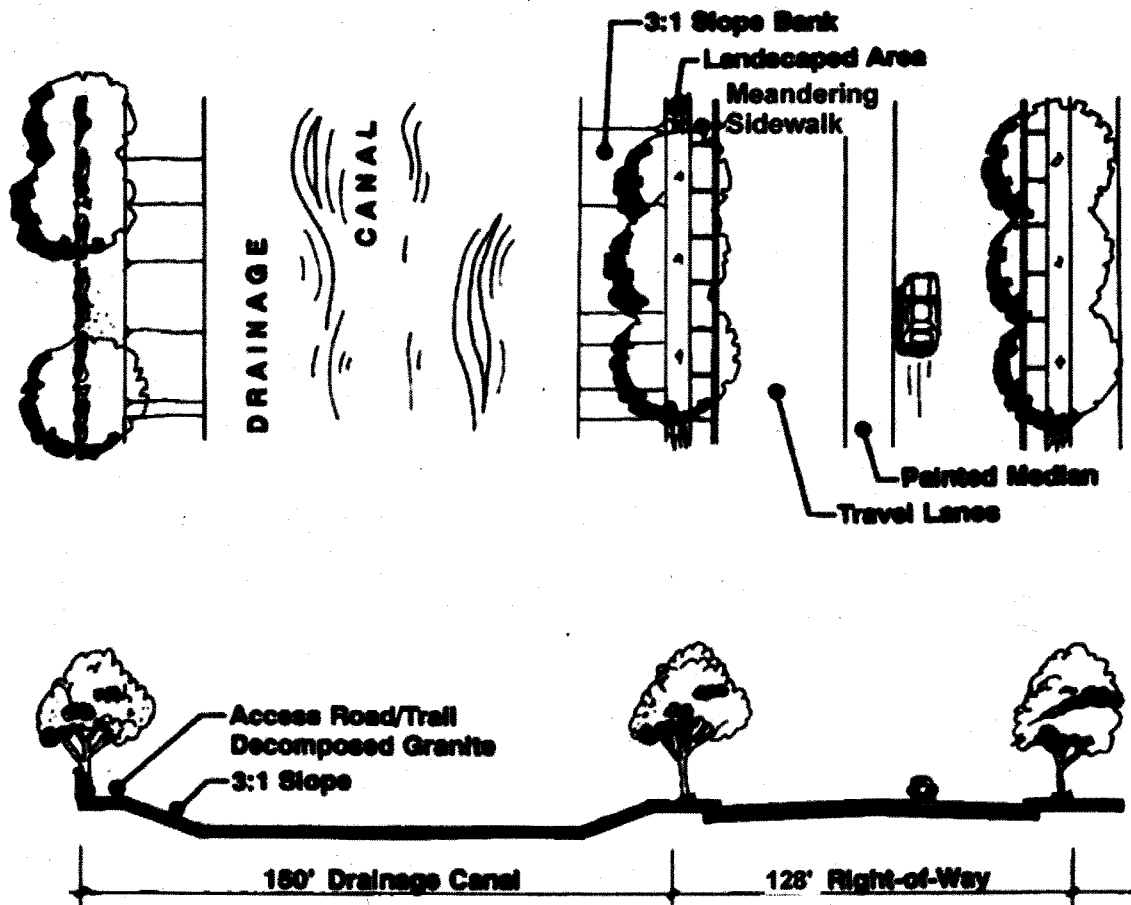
, Arterial Streetscape 2, Polk Streetscape 2B depicts the project edge where the drainage facilities about Polk Street.
